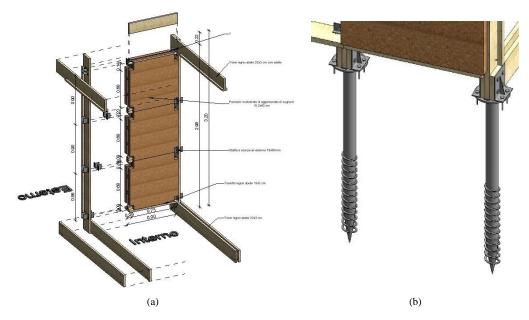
Structural design of the basic module: (a) Shear wall, (b) Screw foundations
